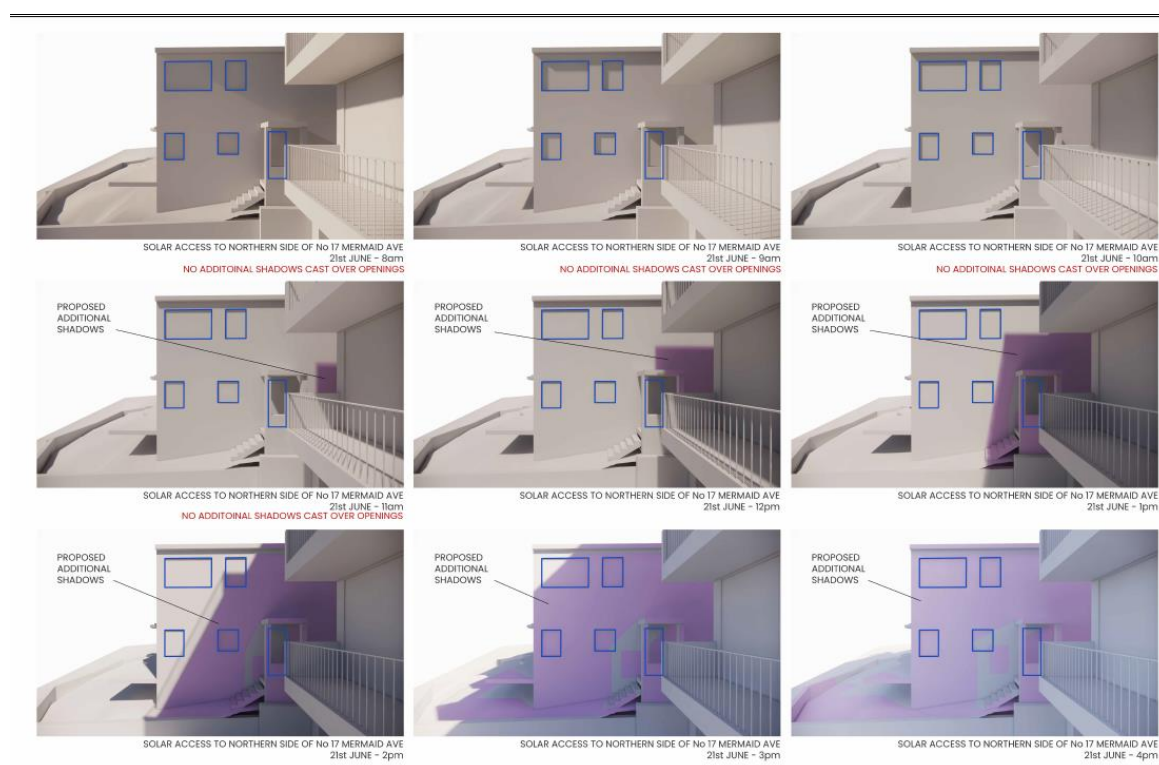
Shadow diagram showing the north elevation at 17 Mermaid Avenue
